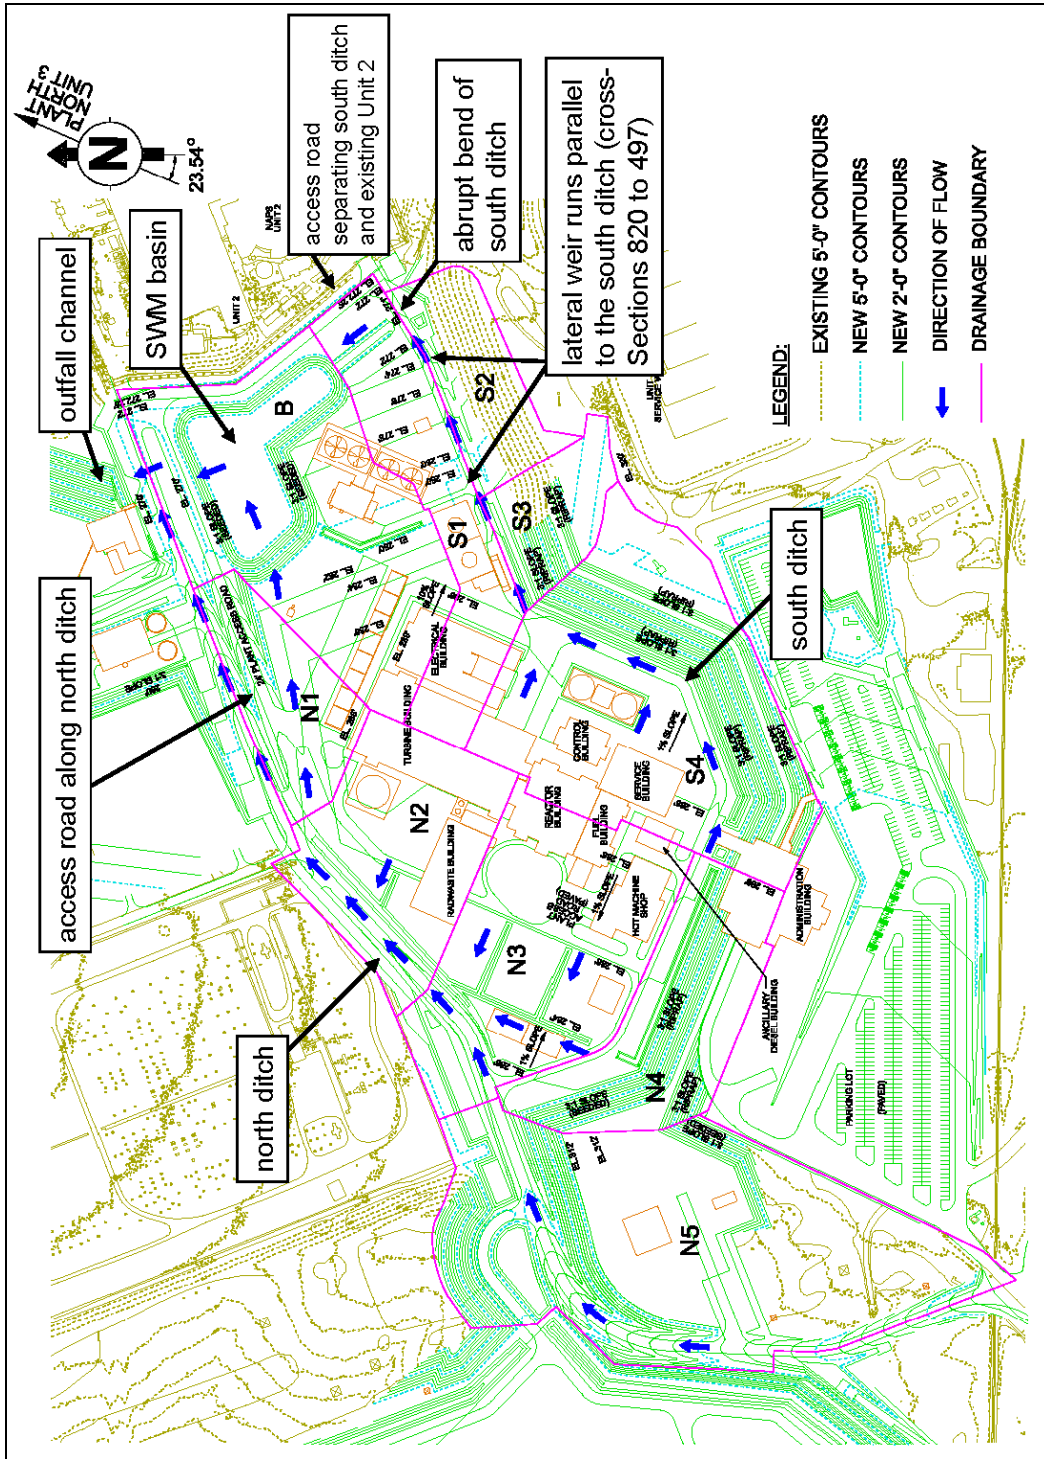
Site layout and sub-basin drainage areas
